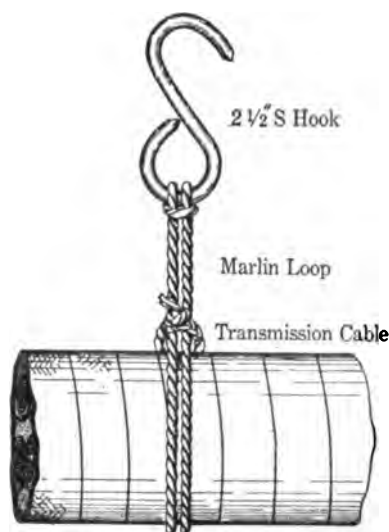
METHOD OF FASTENING S HOOKS TO AERIAL CABLE
